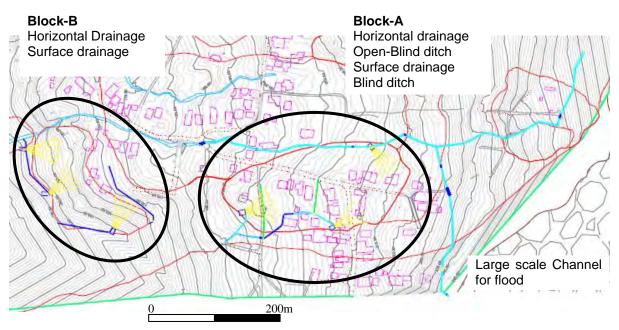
Plan of Countermeasure Works in Chitrakoot Area (source: JET)
